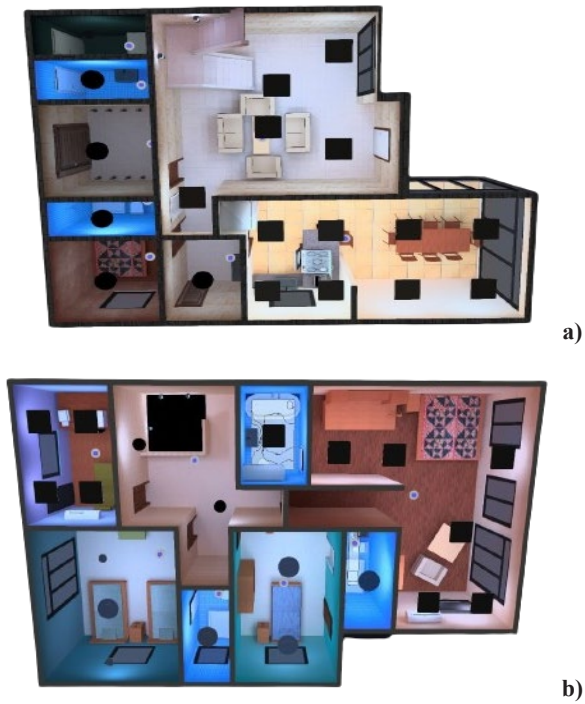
(a) Illuminated ground floor, (b) Illuminated first floor.
